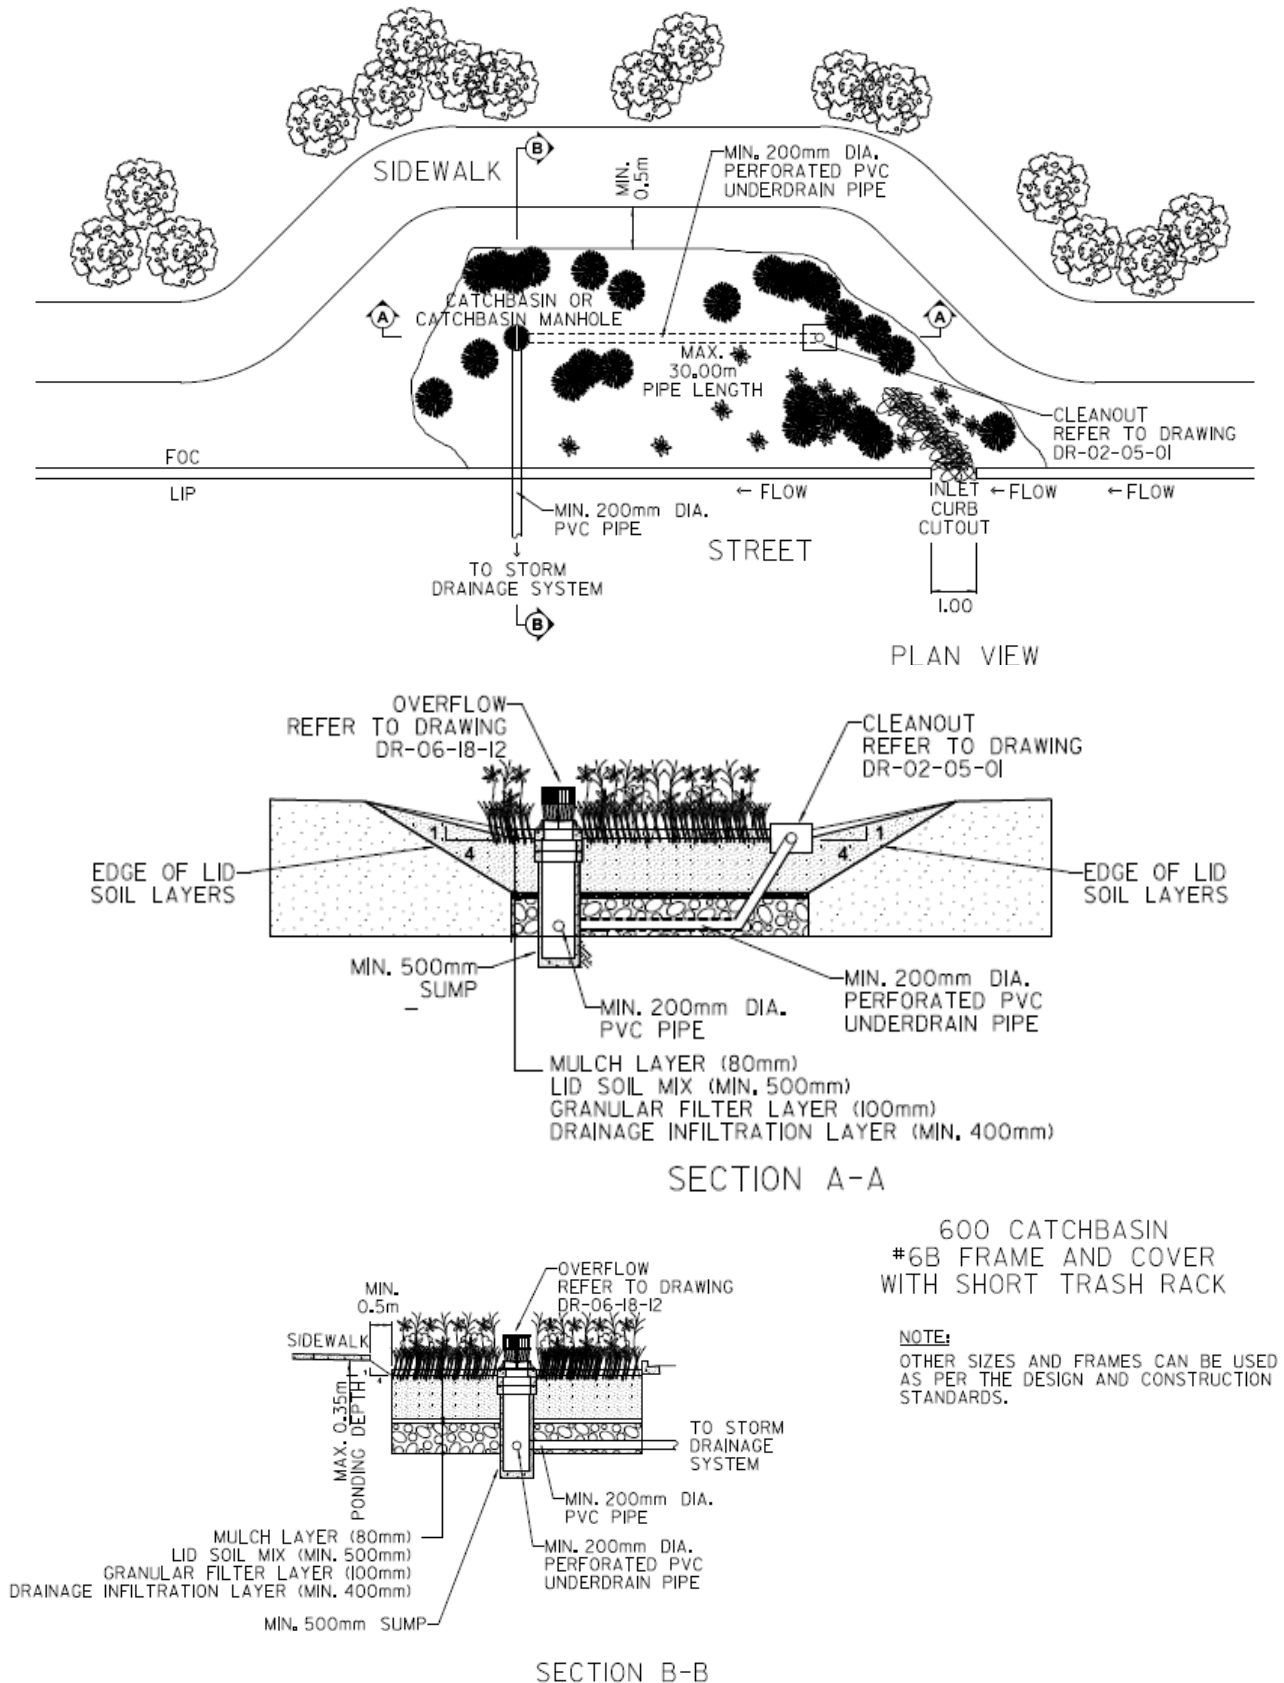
Bioretention Basin Plan View and Cross Sections
